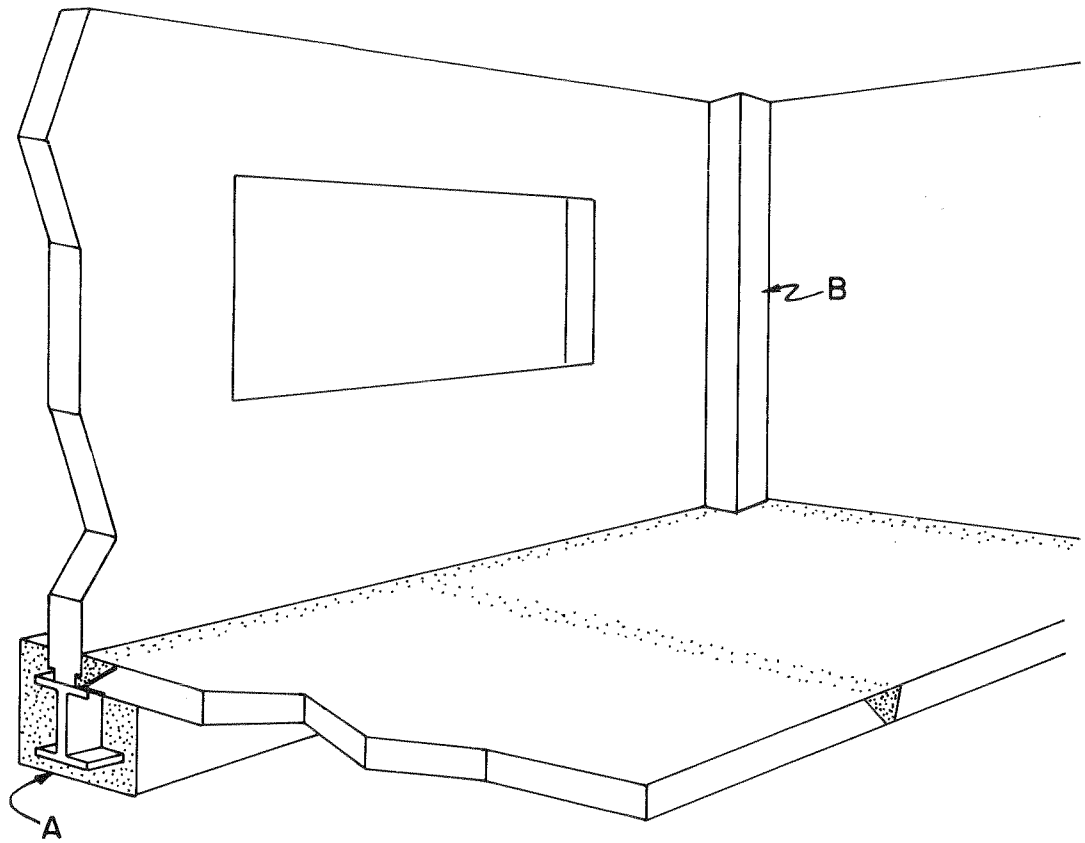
POSSIBLE DETAILS FOR STRUCTURAL SYSTEM OF STEEL ENCASED IN CONCRETE, WITH PREFABRICATED CONCRETE FLOOR AND WALL ELEMENTS
